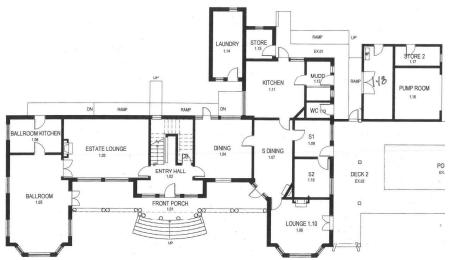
Ground Floor Plan of the Earnscleugh House, showing the Space/Room Numbers for identification.
